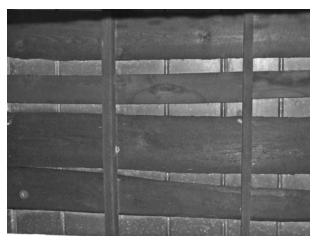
View of typical decking on roof of 1927 addition. Note absence of nails protruding through the decking suggesting that it was never covered with wood shingles.
